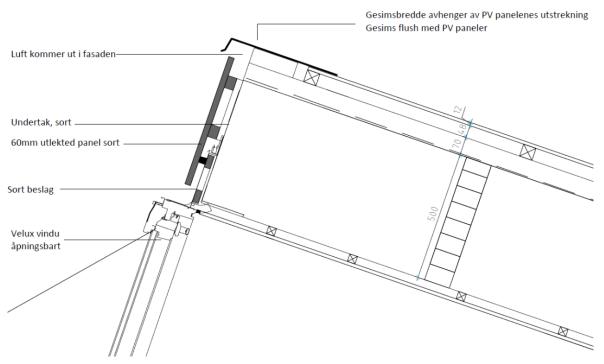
The transition from the tilted wall elements to the roof (window / top of the monopitch roof). Source: Snøhetta.
